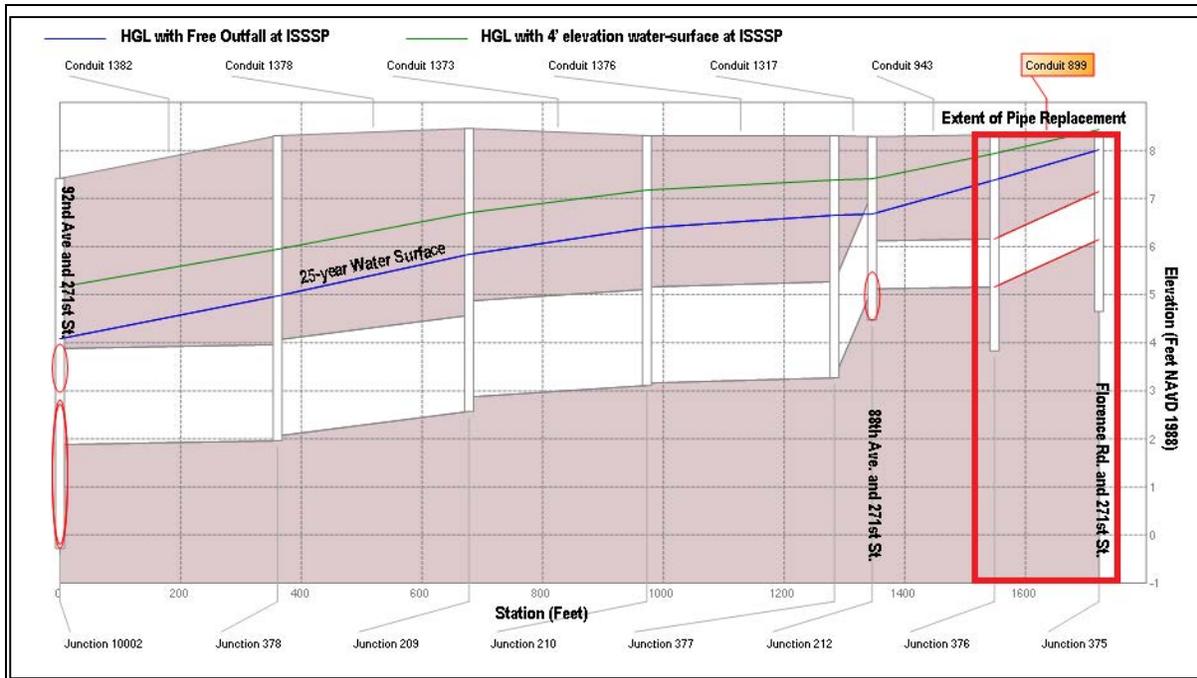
CIP Project #8 – 271st Street NW (Main Street)
